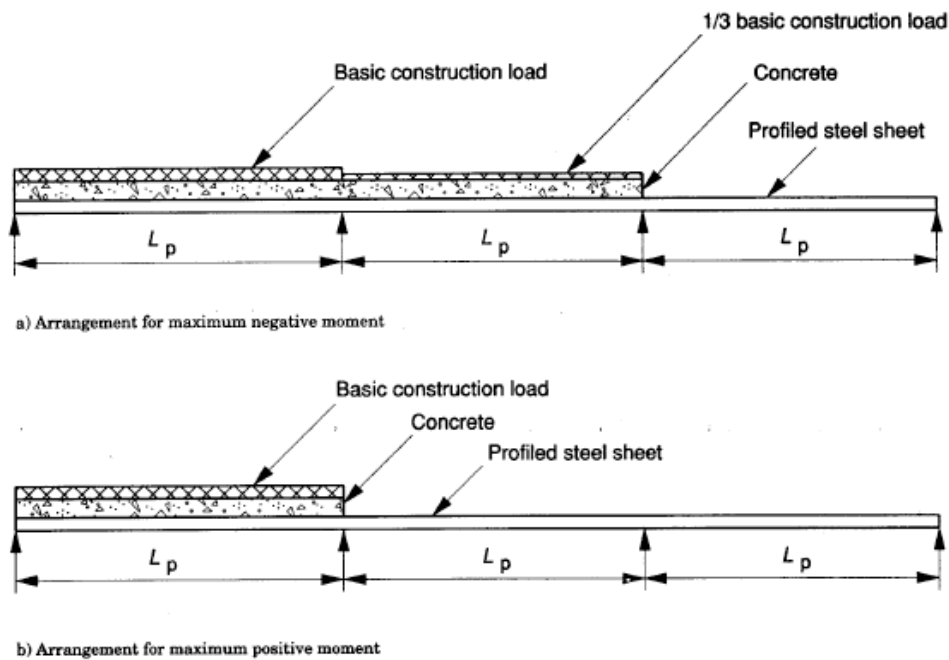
Load arrangements for sheeting acting as shuttering (Continuous slab case)
